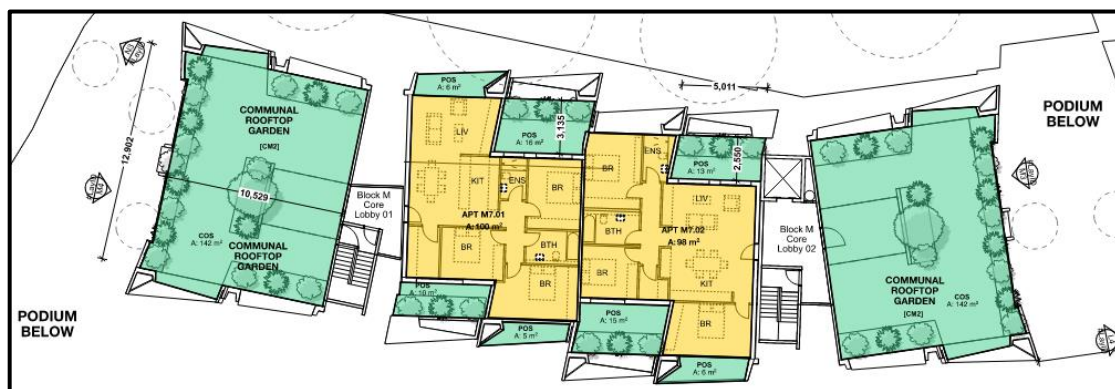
The roof top view of Building M showing the roof top gardens at either end of the building.
